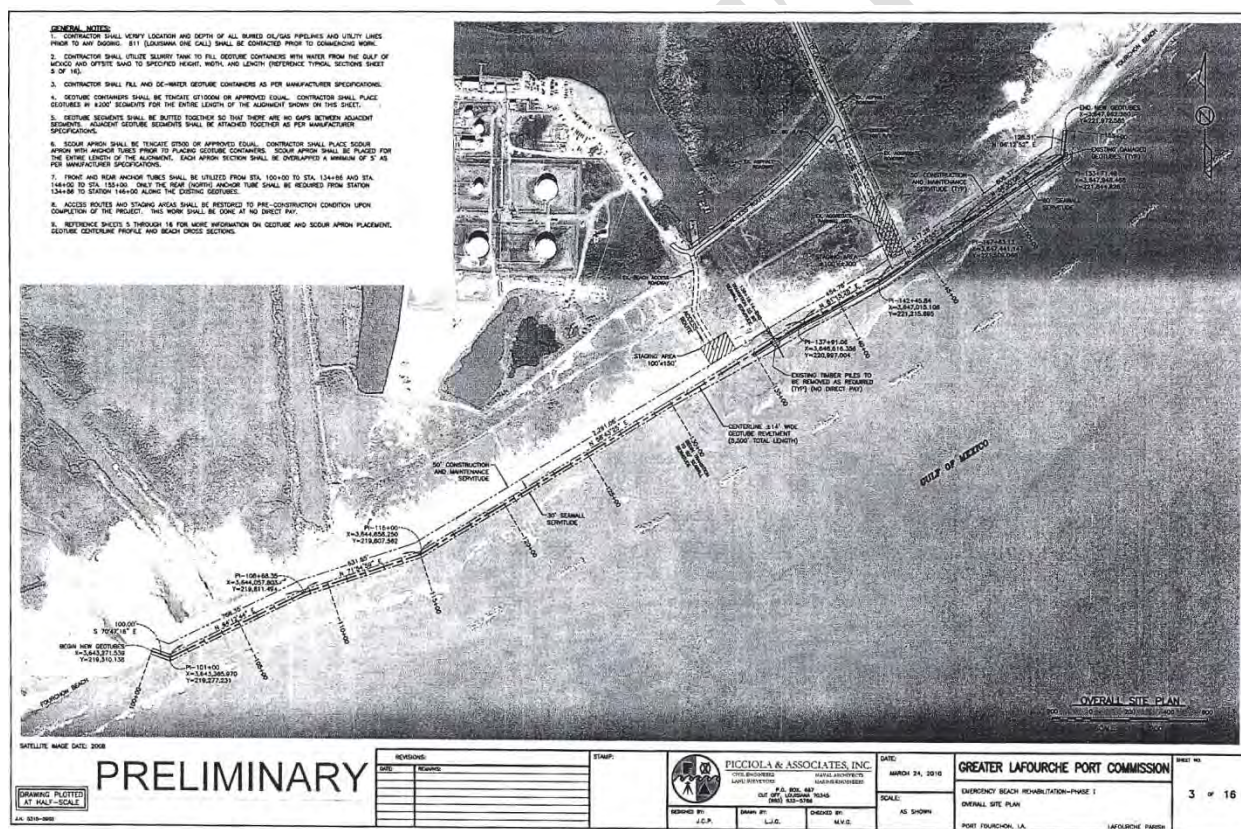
Fourchon Beach Geotube System Site Plan (Picciola & Associates, 2010)
